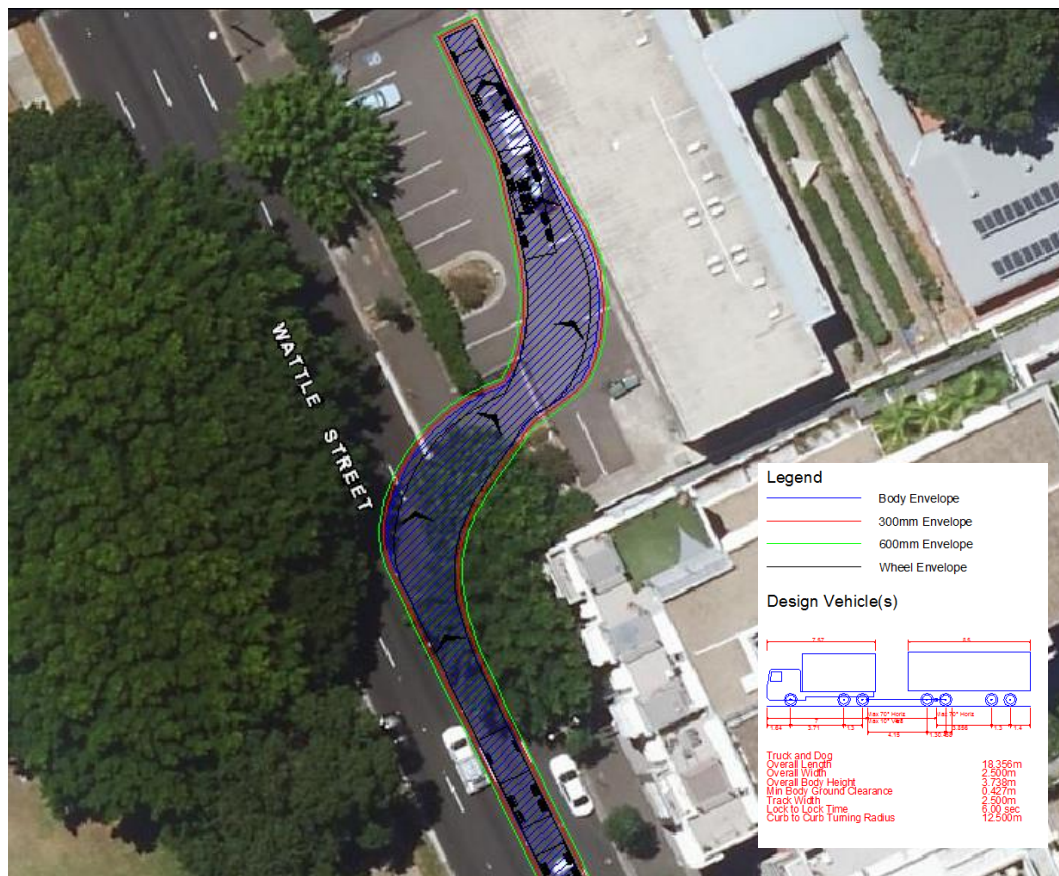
Swept path of 18.3 metre truck and dog entering the site from Wattle Street
